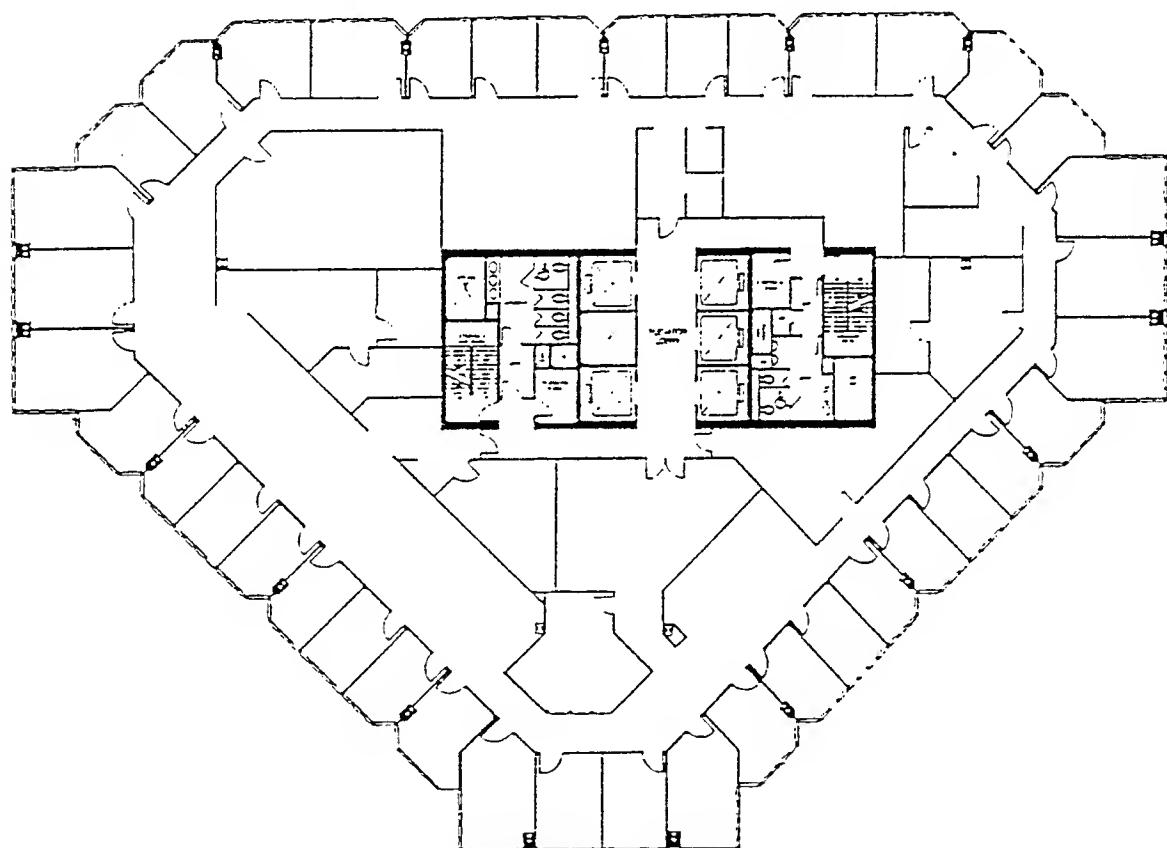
Typical floor plan of Phase I with proposed office layout
